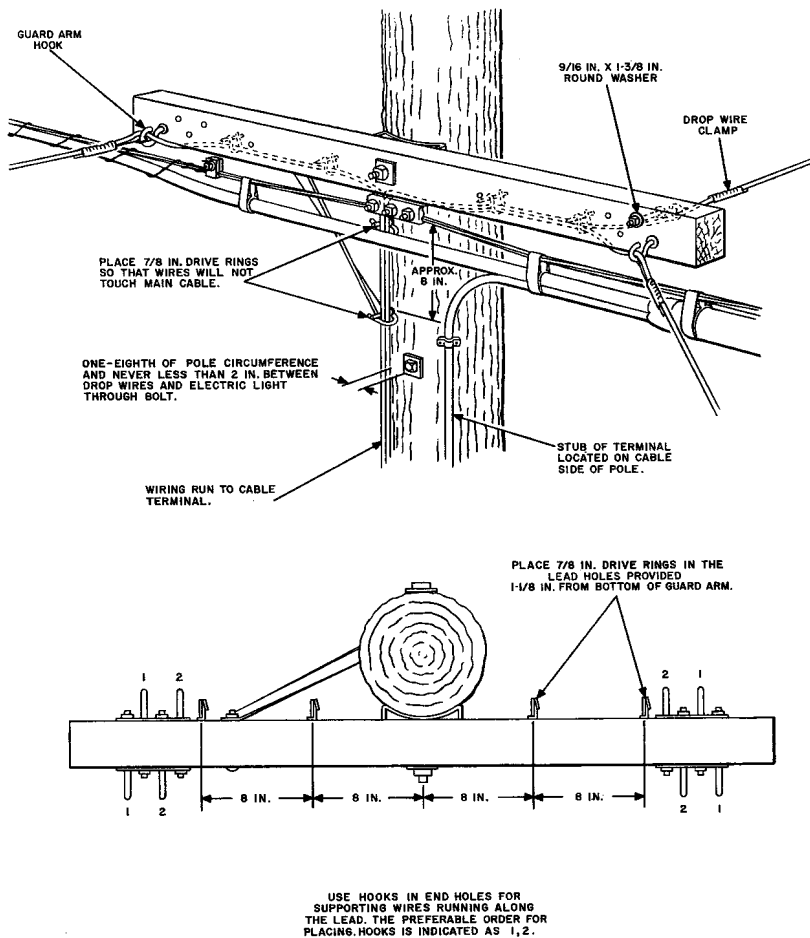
Cable Terminal Mounted on Cable Side of Pole
